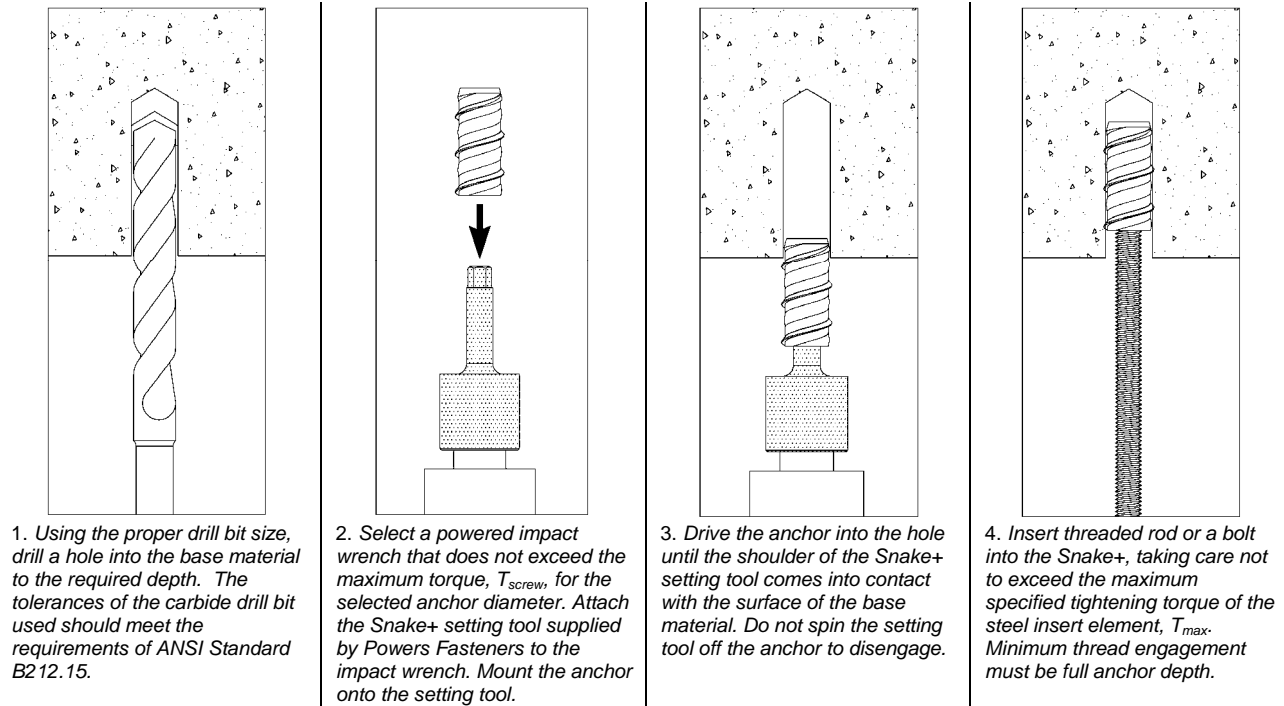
SNAKE+ SCREW ANCHOR INSTALLATION INSTRUCTIONS
